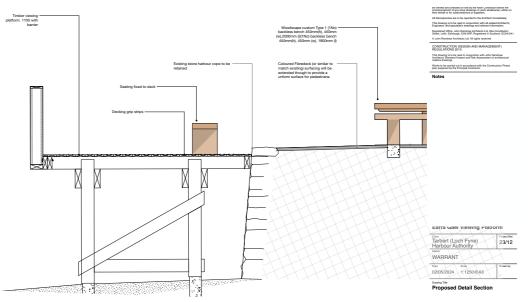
Proposed site section facing west @ John Renshaw Architects
